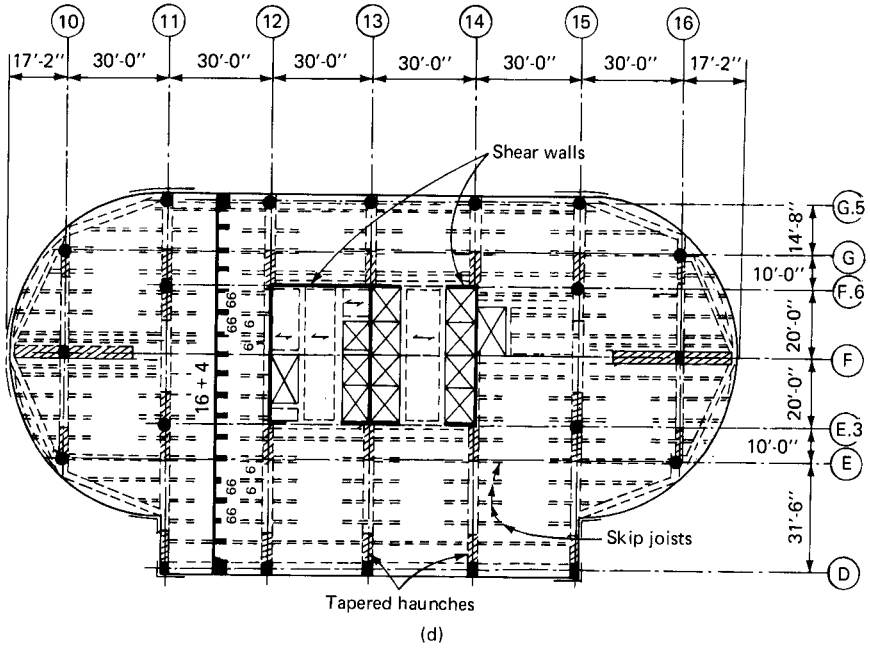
(Continued) (d) levels 40 through 47 floor plan; (e) levels 48 and 49 floor plan;
